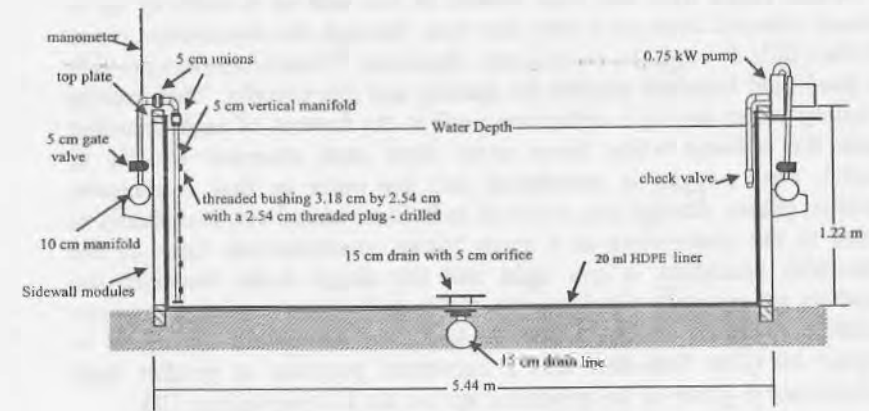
Cross-section of mixed-cell raceway showing construction details, pipe manifolds, vertical manifolds and drain details (Ebeling et al., 2005).
